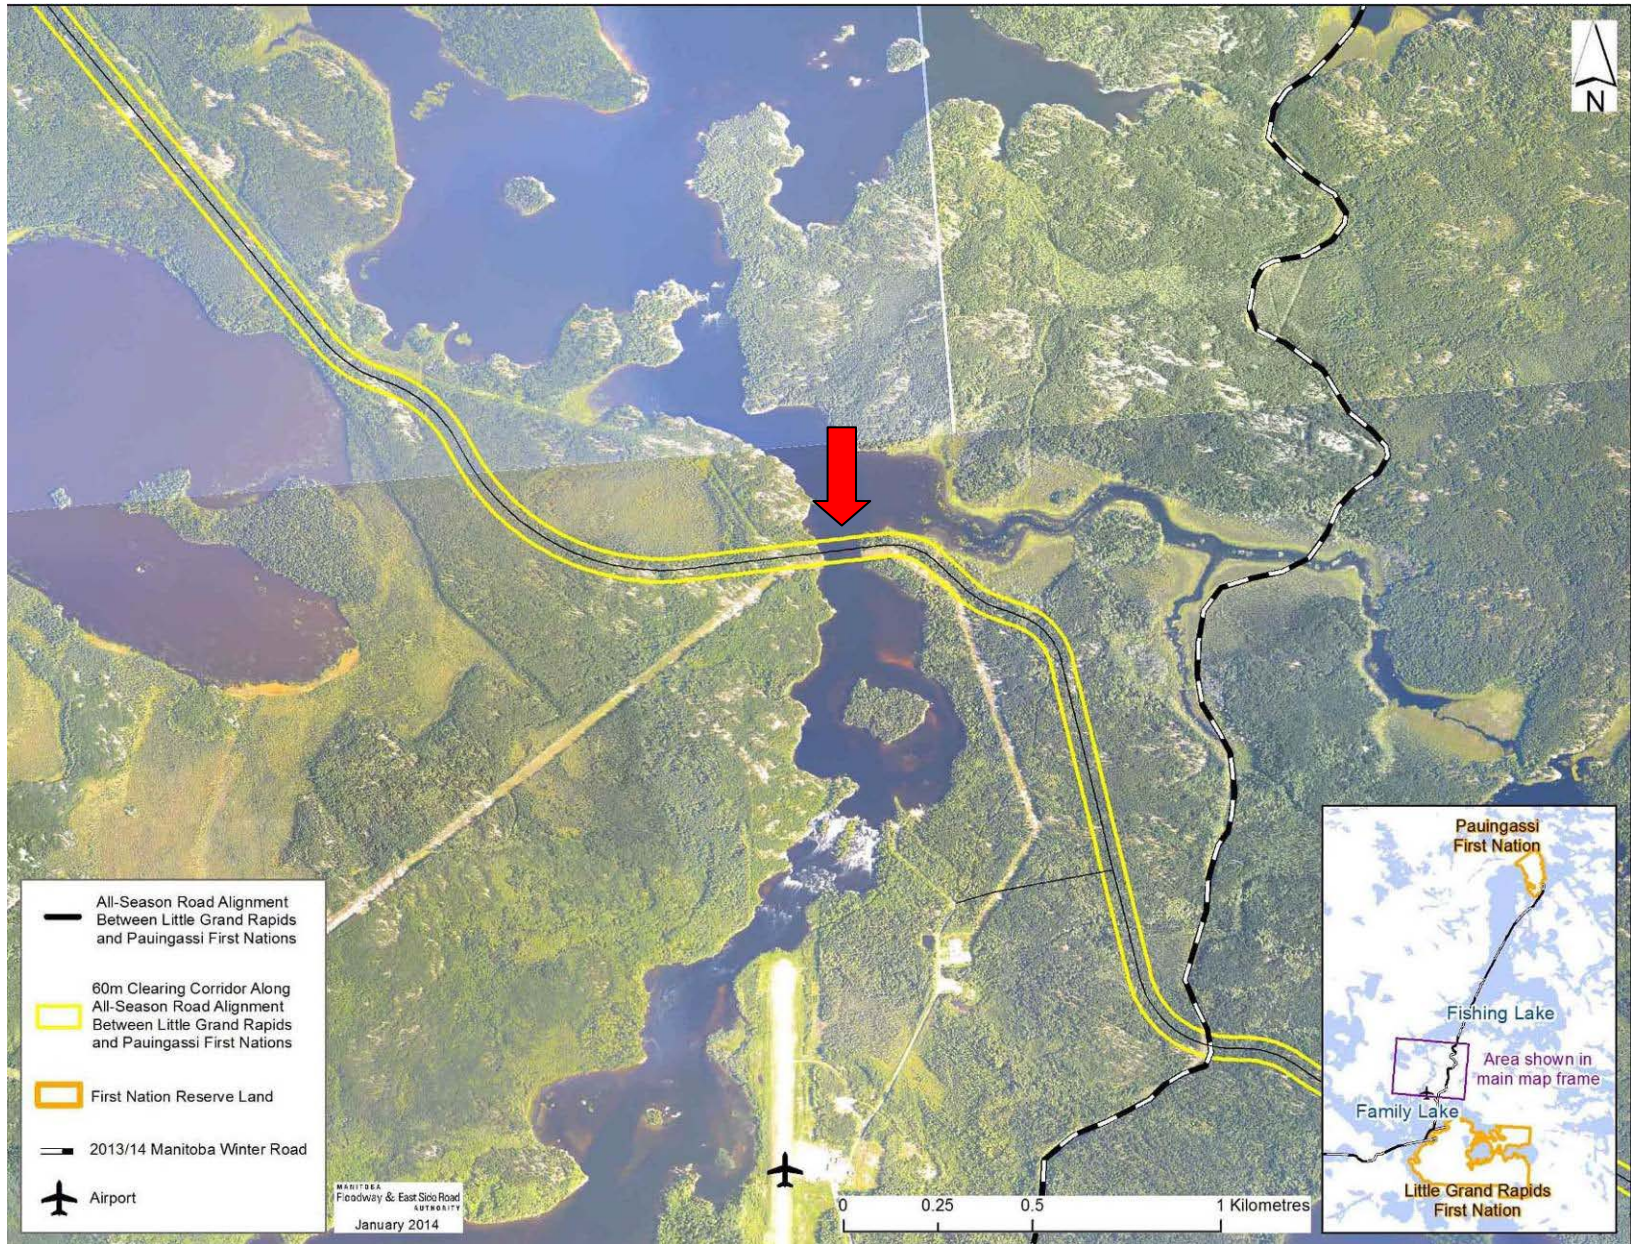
Proposed Bridge Location Between Family and Fishing Lakes (Unnamed Creek)
